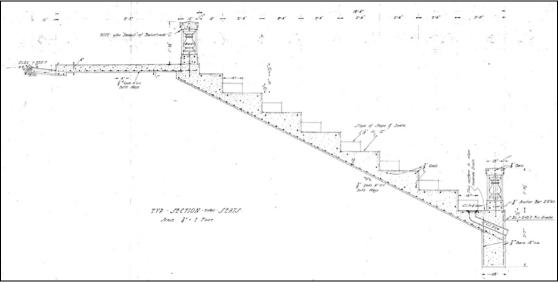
This August 10, 1920 detail illustrates the section through the concrete amphitheater by Fiske Kimball, Architect. (R-JAV-FMRC-FF-1920-10-08-41707 M-5-Original Construction Plans and Elevation Amphetheater-section.jpg).
